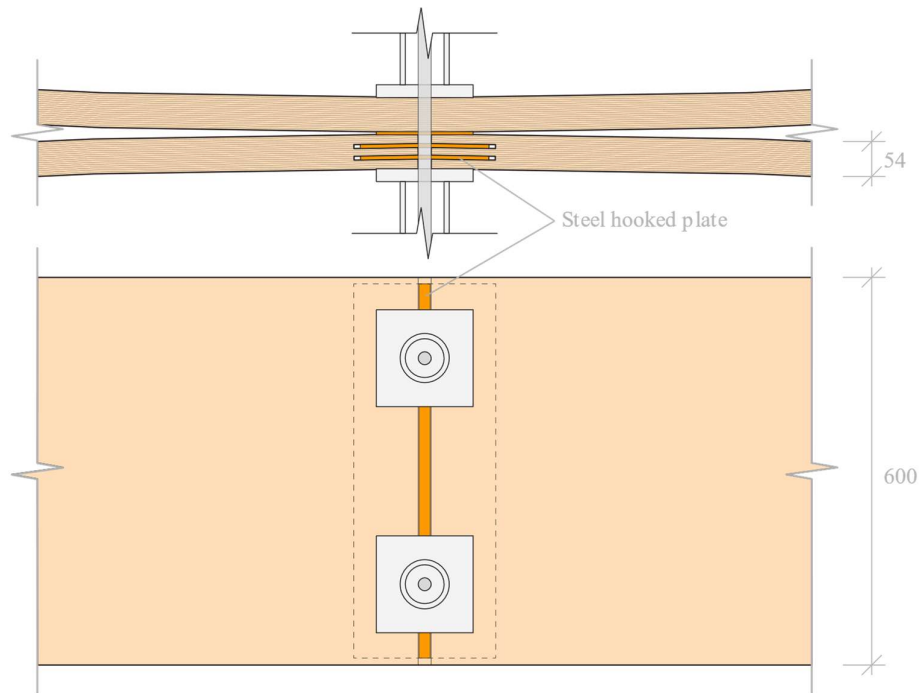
Detail of joint for the bent LVL panel as well as the connection to an adjacent panel.
